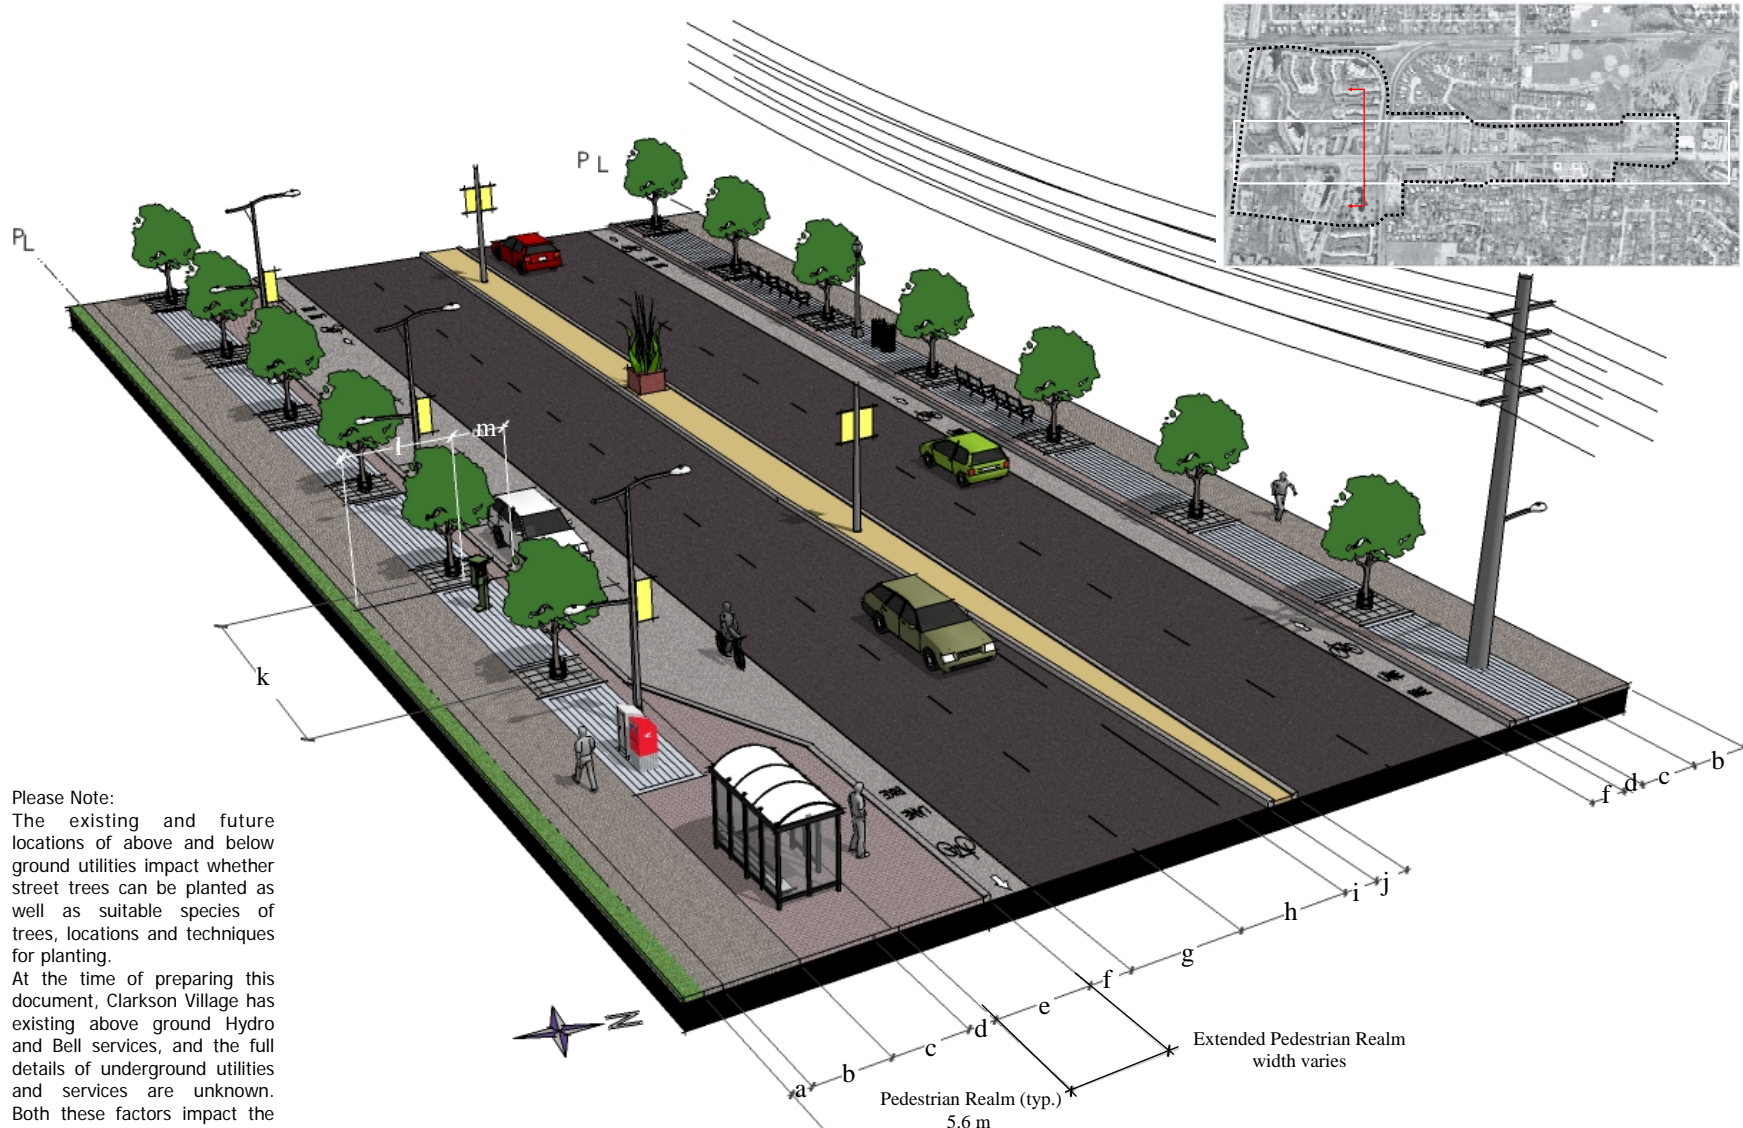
West Village Gateway Area, Mid Block Cross Section, Proposed Streetscape
